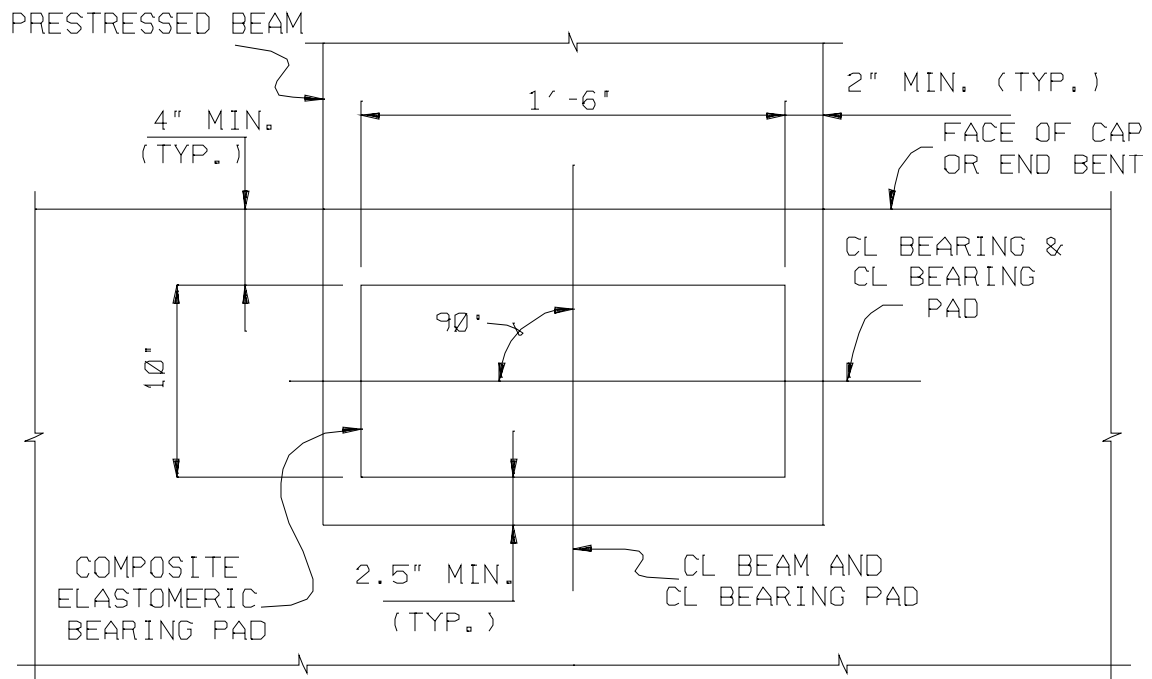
Partial Plan – Neoprene Bearing Pad.
